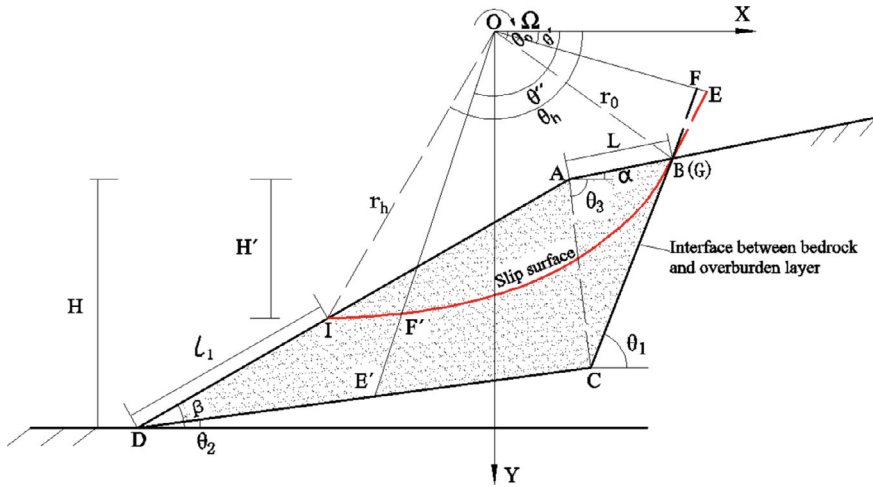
Local failure of the slope with cracking at the top (case 3)
